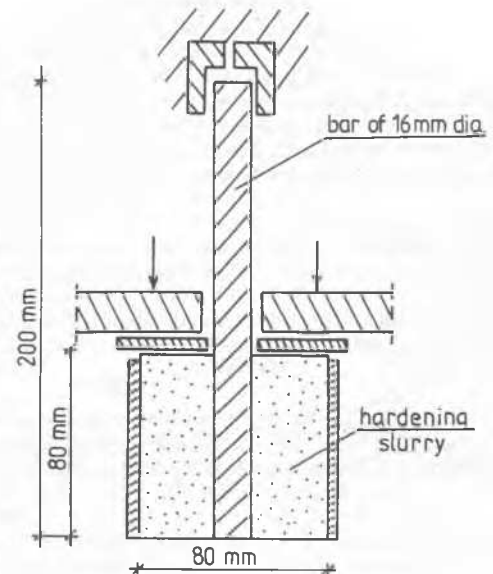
Pullout specimen with a bar embedded in the hardened slurry
